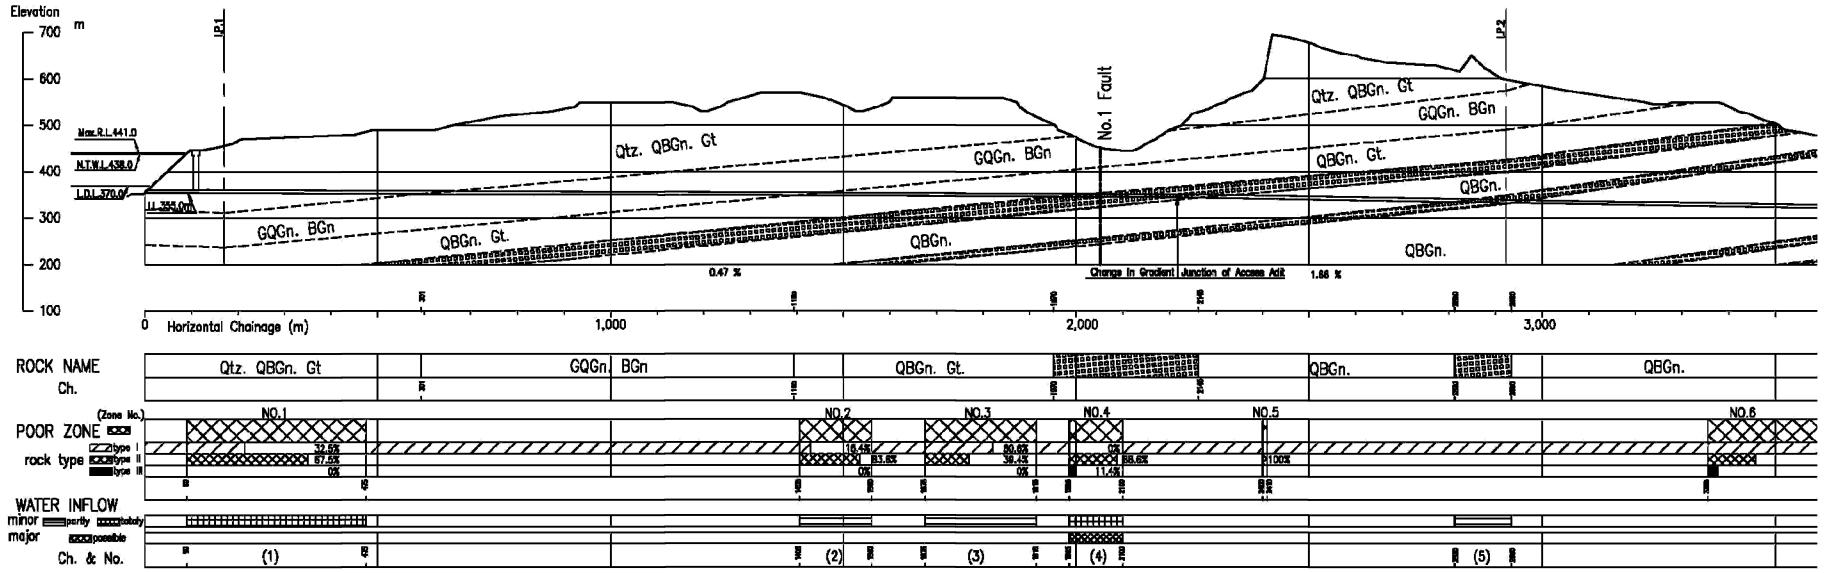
Geologic Horizontal Section at Tunnel Level
